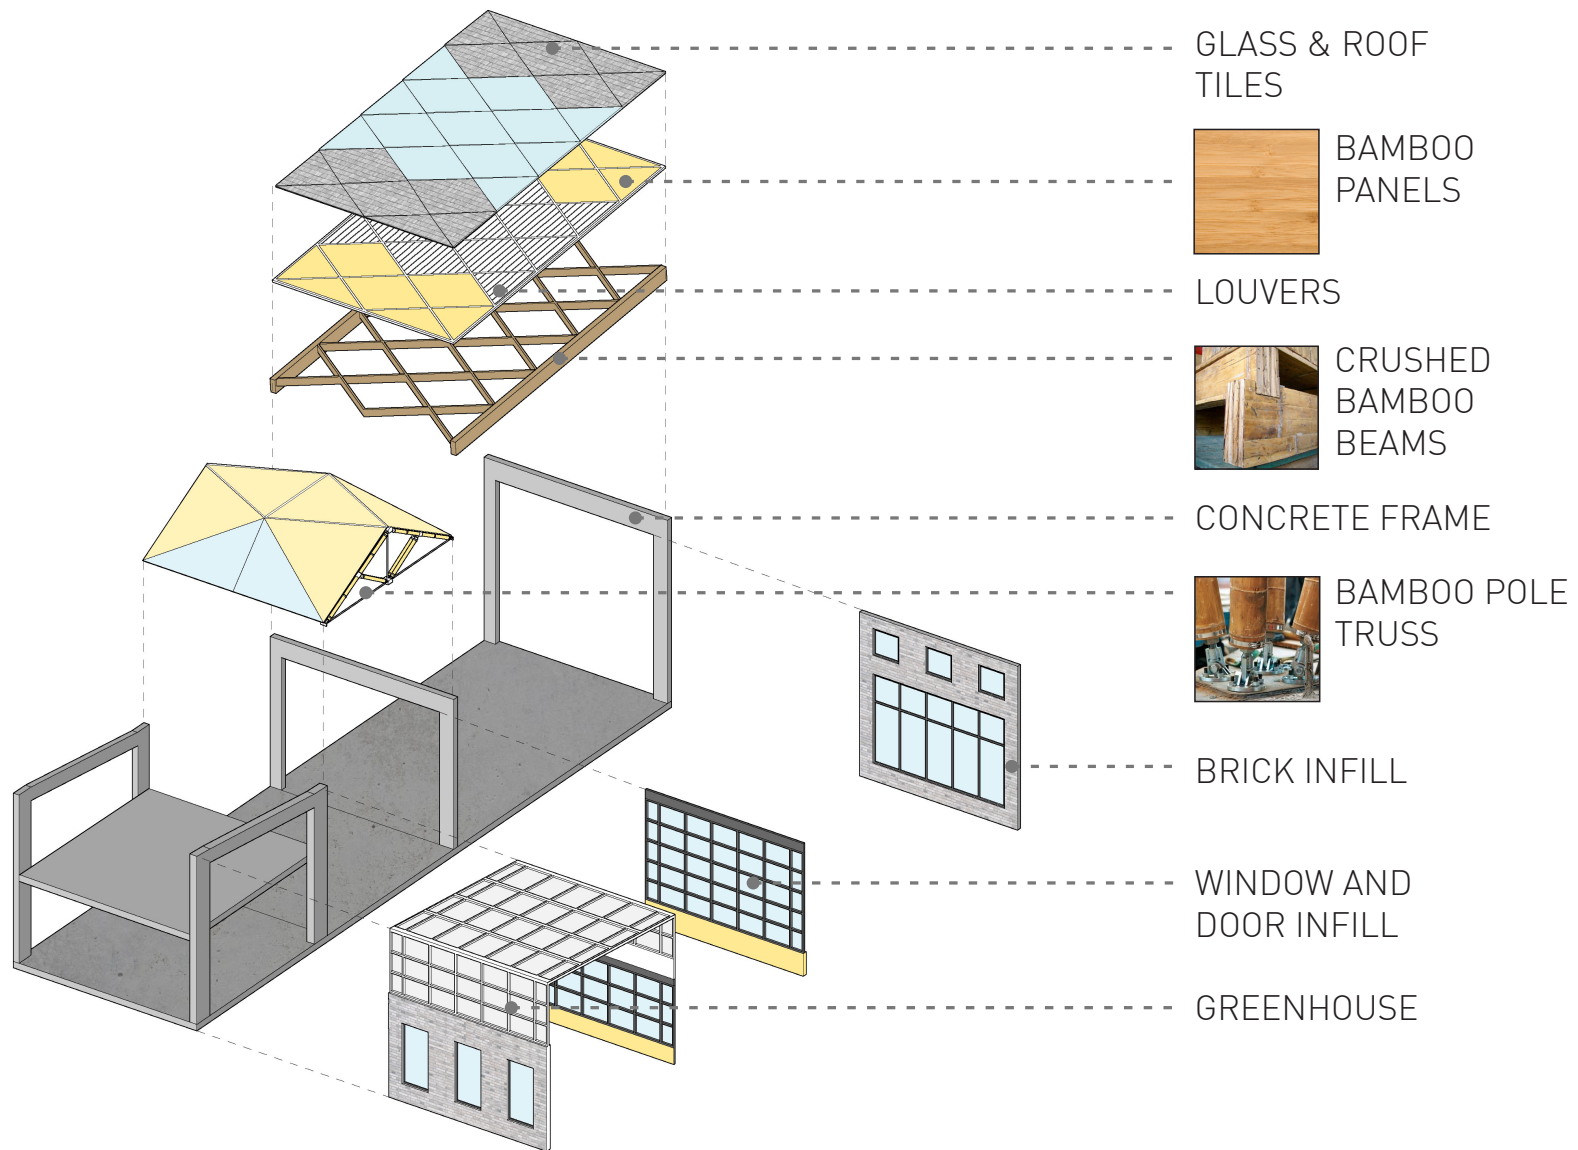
The tectonic system consists of a concrete frame with brick infill at the exterior and porous windows and sliding doors lining the interior. Bamboo spans the ceiling and bamboo finishes act as a warm highlight at various places through the building.
